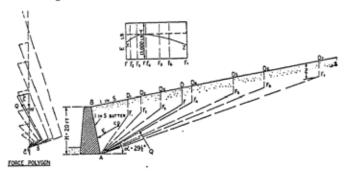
Retaining Wall. Surcharged Clay Back-fill. (Problem 57.)
